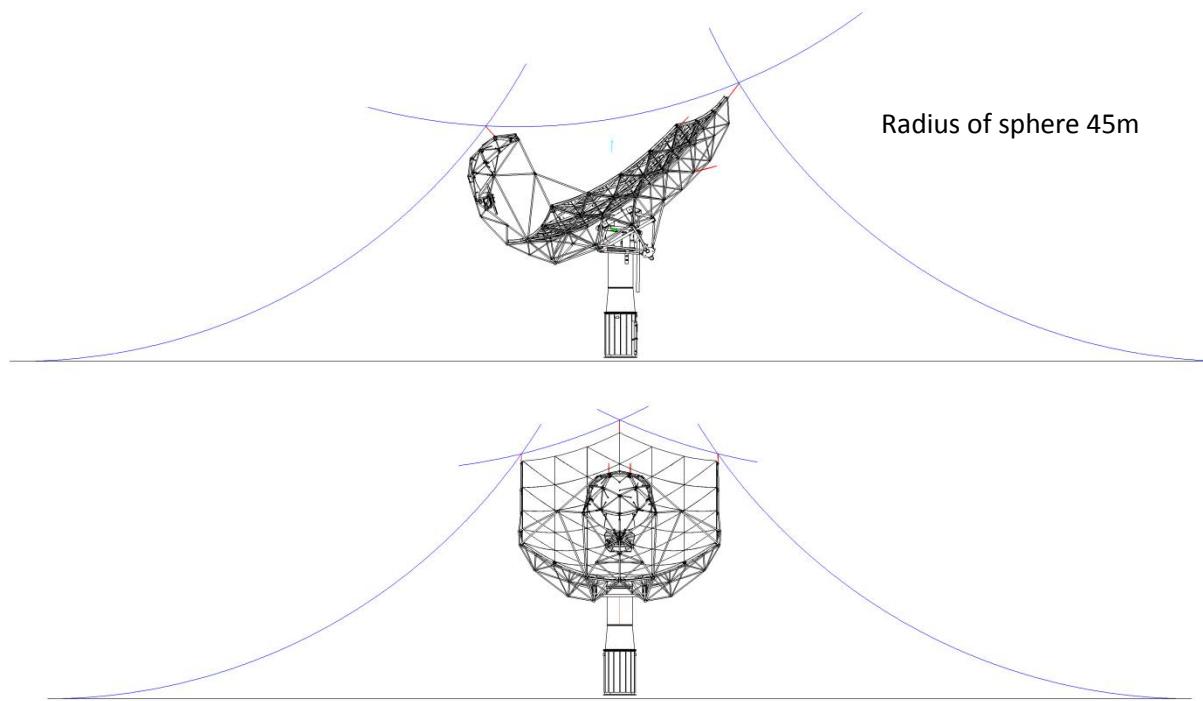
Air termination Protection Range (Elevation Angle=90°)
